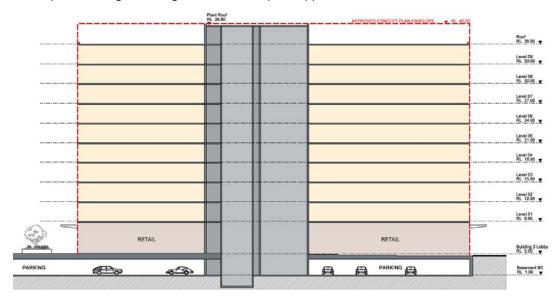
Existing Section through Building 3 and relationship with approved building envelope
